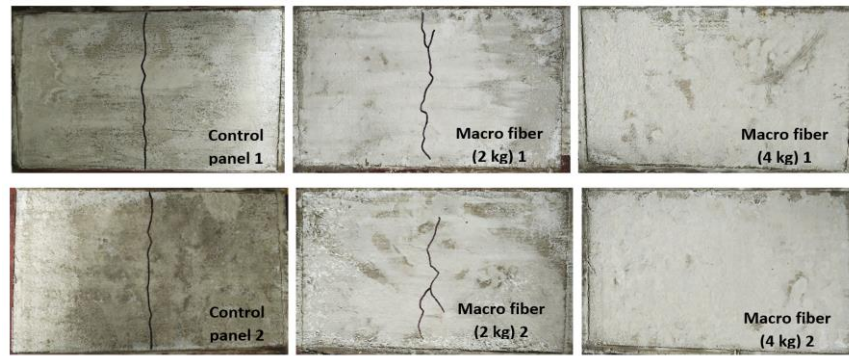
Crack patterns of concrete specimens tested according to ASTM 1579-13.
